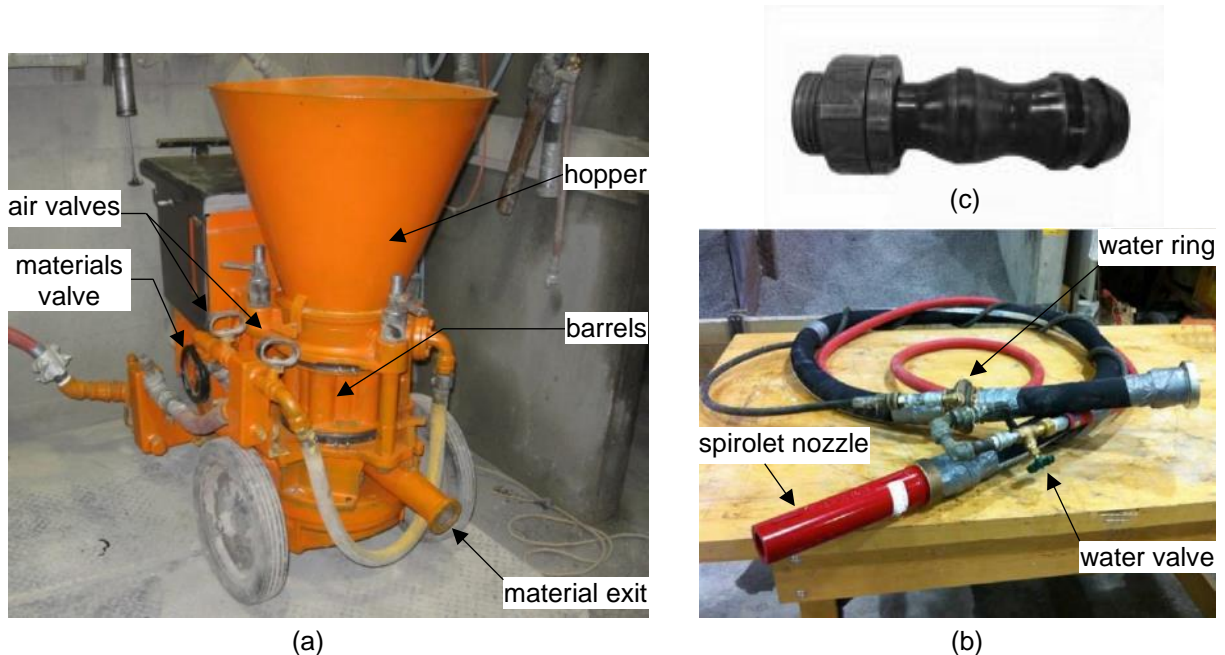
(a) Aliva® 246 dry-mix shotcreting machine, (b) spirolet nozzle mounted on pre-wetting lance and (c) double bubble nozzle tip used in this study
